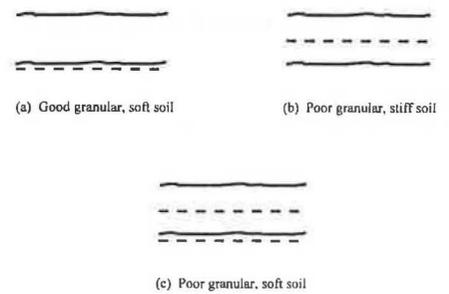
Geosynthetic reinforcement of haul roads or foundations to permanent roads
